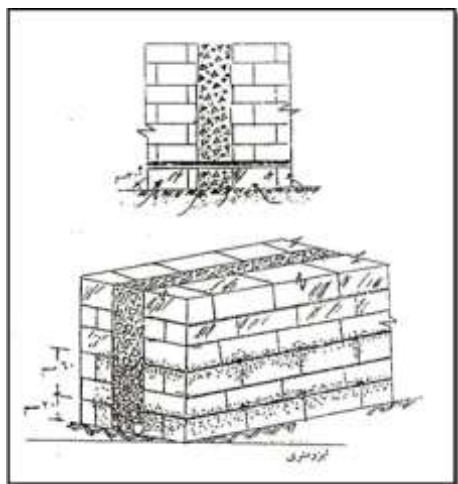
Construction system of the double faced masonry walls in Islamic monuments in Cairo.
